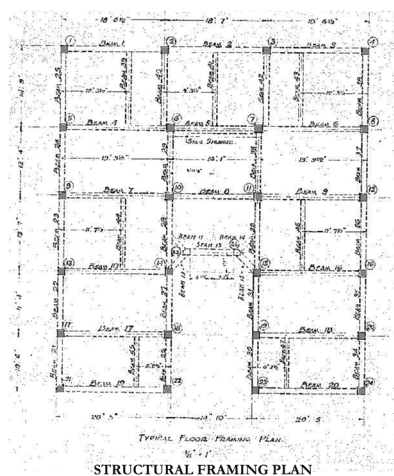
Typical Floor Framing Plan for Block of Flats for Mayfair Flats, left, by Gummer and Ford.
